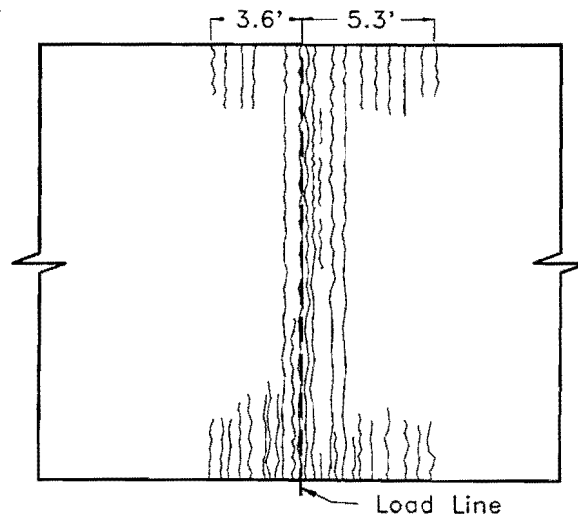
Cracks on Bottom Surface of Slab Under Load
